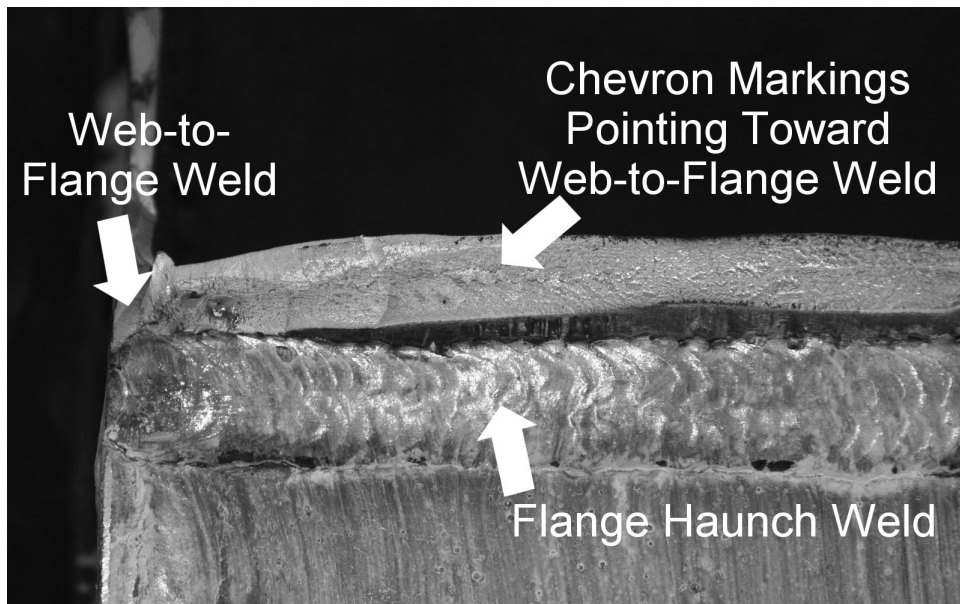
Fracture Surface of Top East Flange of Specimen X1L1.6
